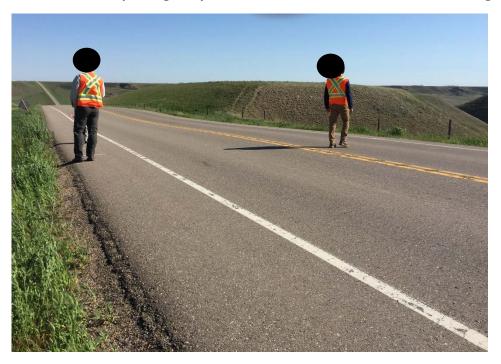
Survey pins installed in the highway in a grid pattern. Centerline of dip area marked on pavement. Photo was taken facing west on May 31, 2017.
